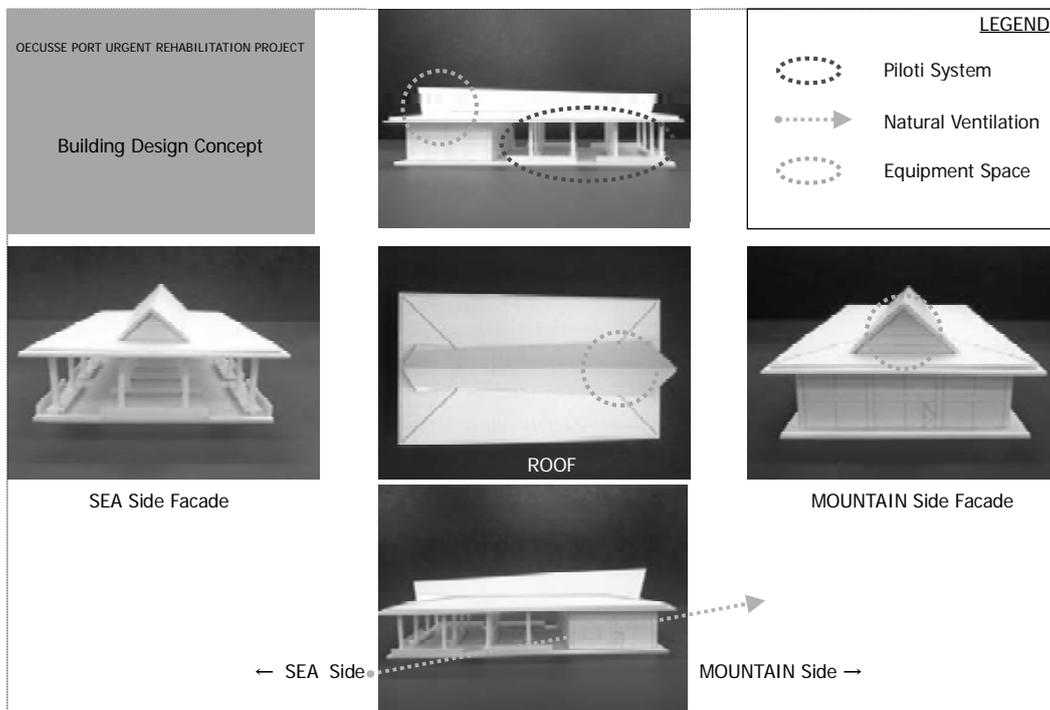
3D Images of Port Office and Passenger Terminal Buildings
